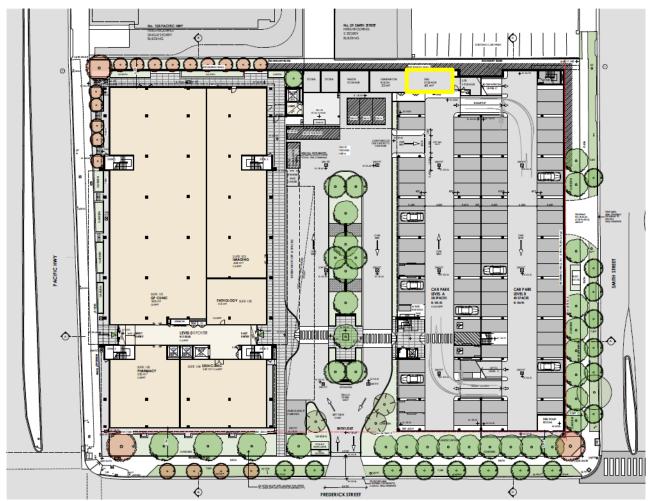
Site layout and location of DG storage as shown by a yellow box.
